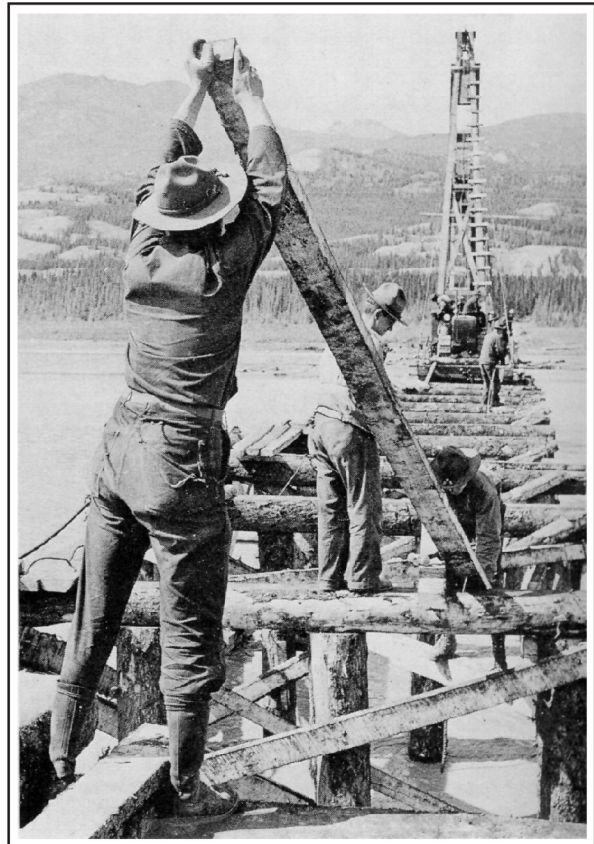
Sheep Creek Bridge, September 1945. Photo courtesy ADOT&PF Bridge Section, Juneau.
